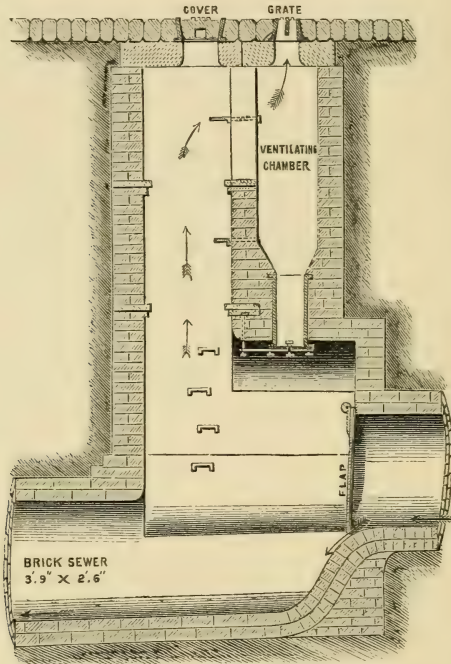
Man-hole, Tumbling Bay, and Double Ventilating Arrangement.
